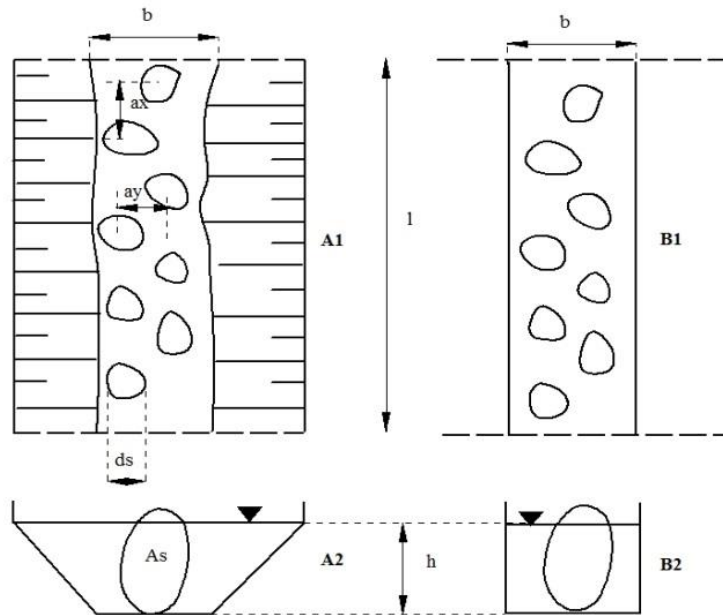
Bypass channel with perturbation boulders (A1 and A2 – trapezoidal section, B1 and B2 rectangular section).
